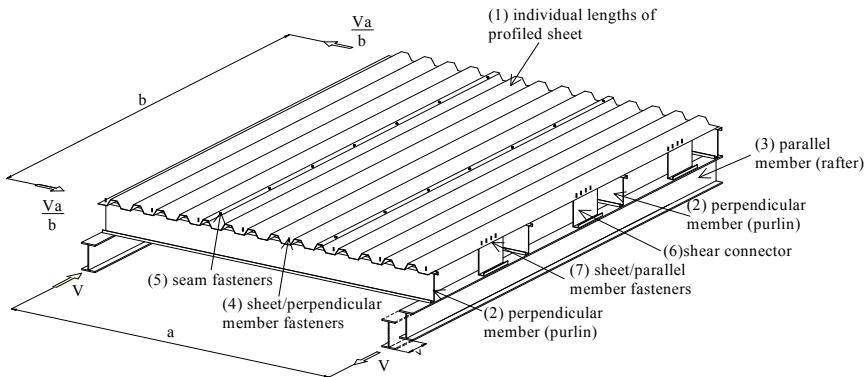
Arrangement of an individual shear panel (ECCS, 1995)
